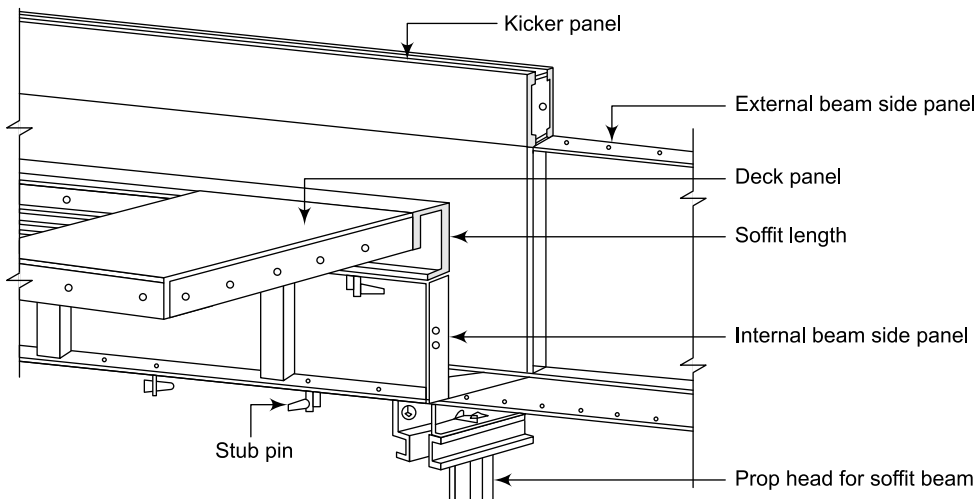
Beam Assembly Details (Courtesy Mivan).
